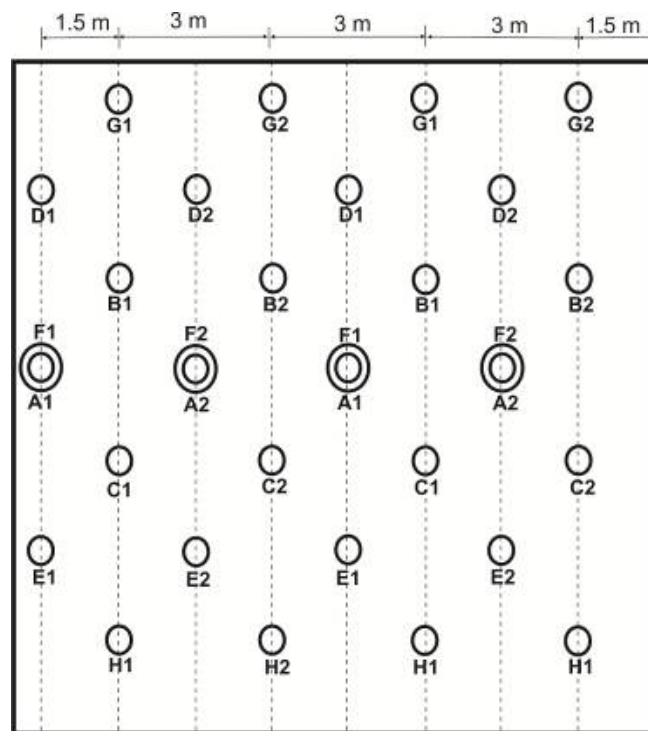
Drilling pattern for consolidation grouting in the Hacinoglu Hydropower Plant Energy Tunnel (HHPT).
